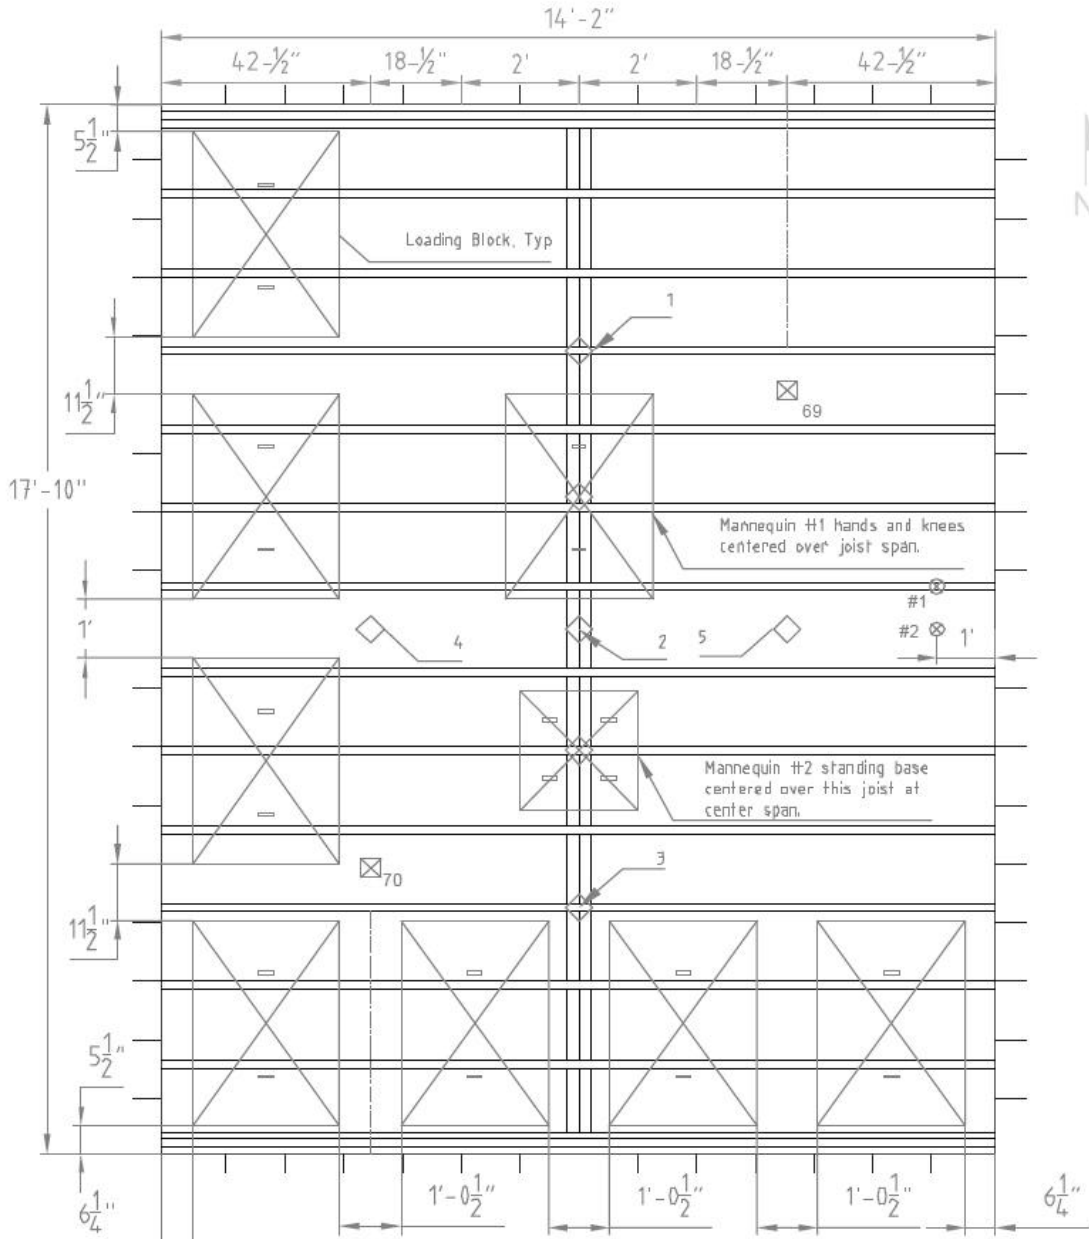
Loading and Instrumentation Layout (See Figure A.8) for assembly 1
